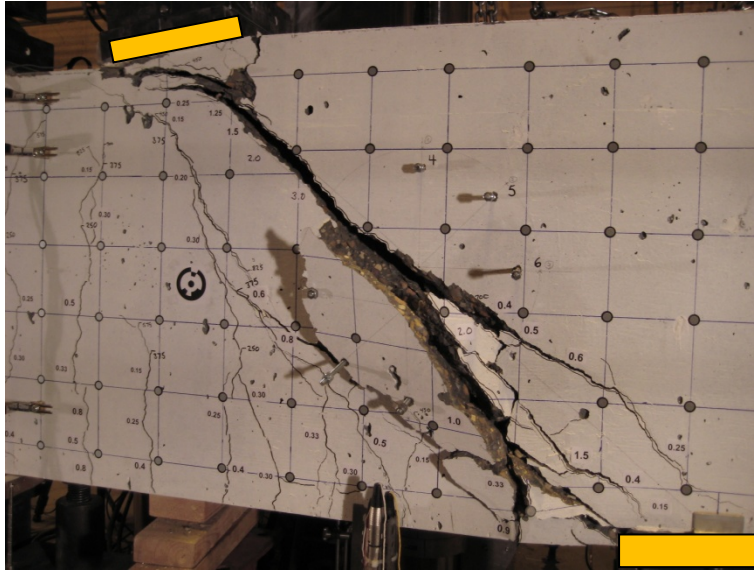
Failure of the compression strut in specimen B5H (shear span B). Loading and reaction plate are shown in yellow.
